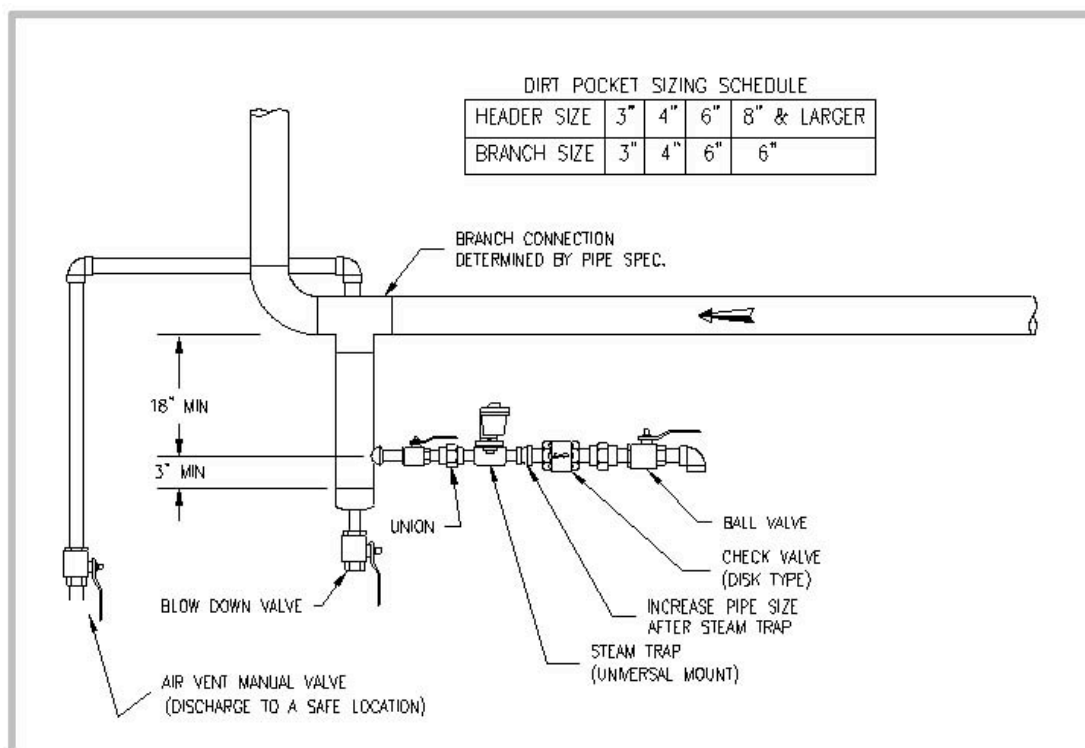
Schematic of a Typical Drip Pocket Steam Trap Installation
